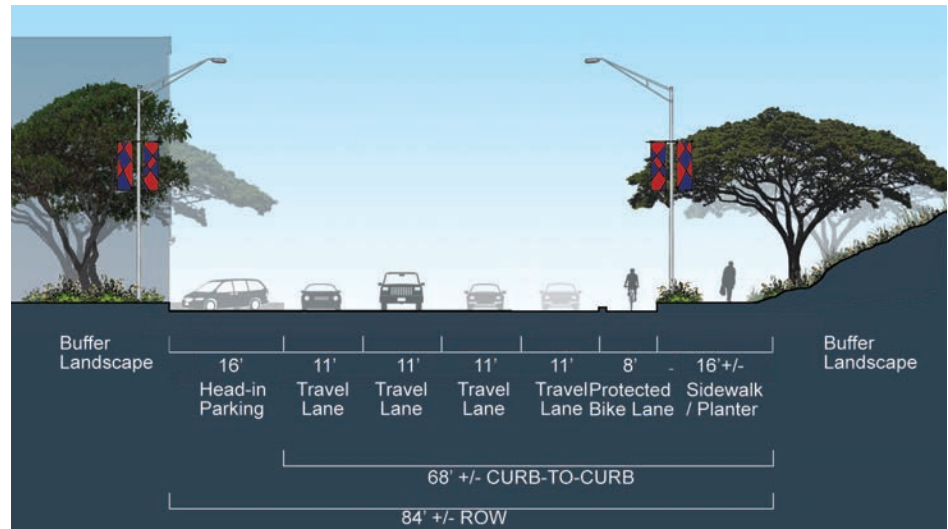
STADIUM LOOP ROAD - SECTION OF POTENTIAL ENHANCEMENTS
